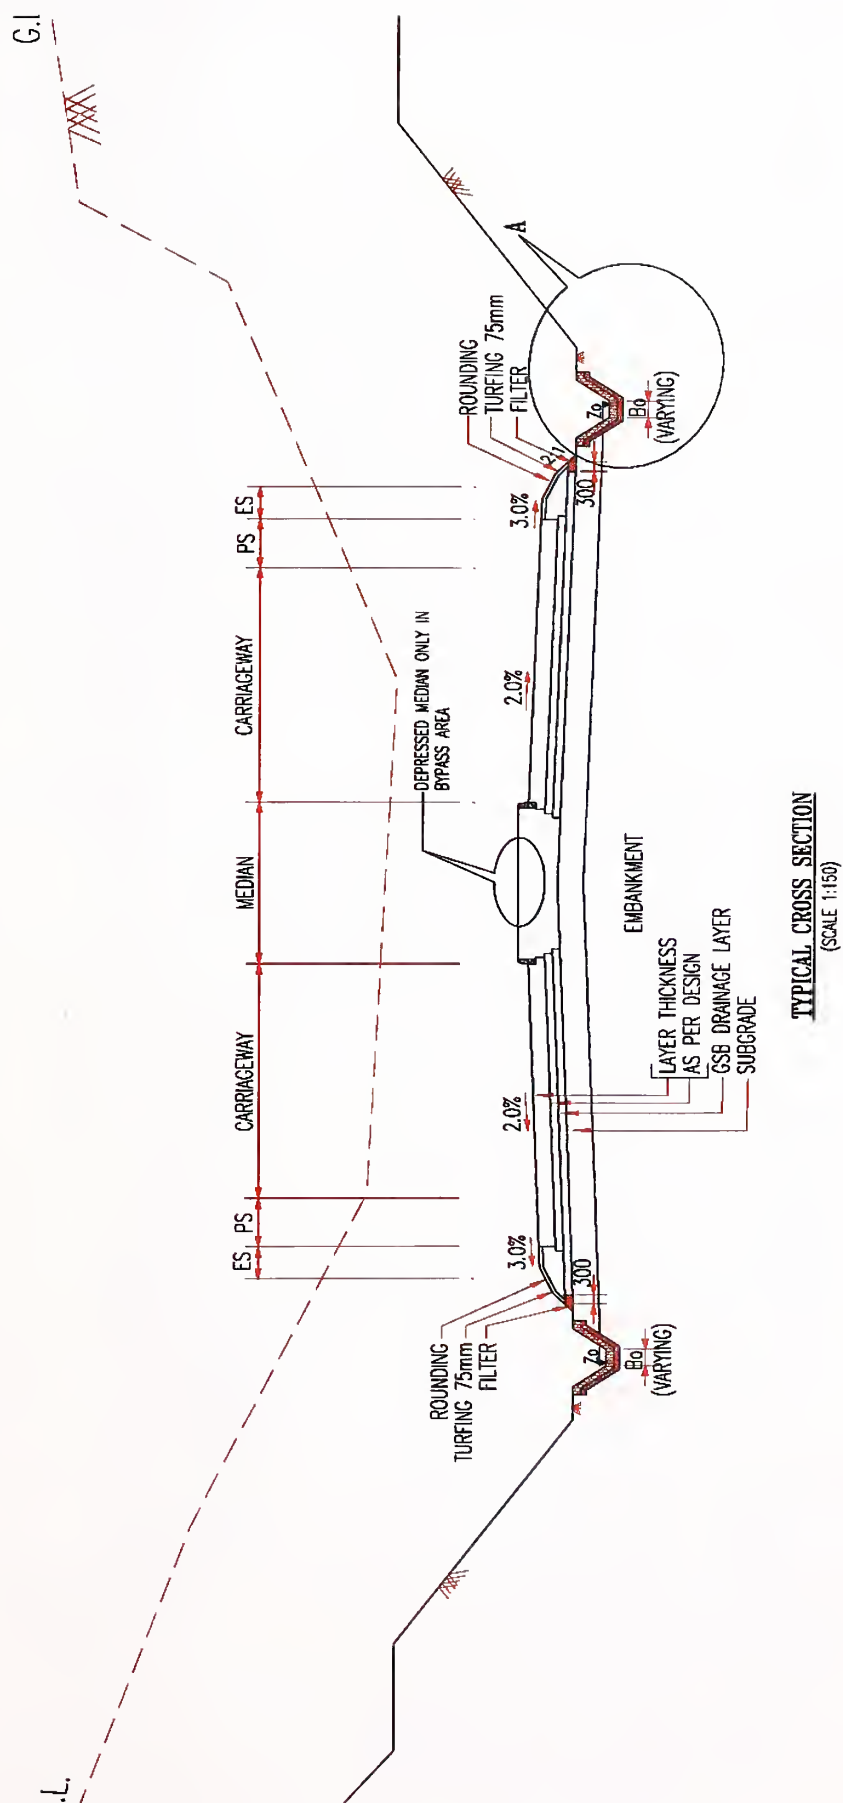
Showing Typical Cross-Section of a Road in Rural Areas
